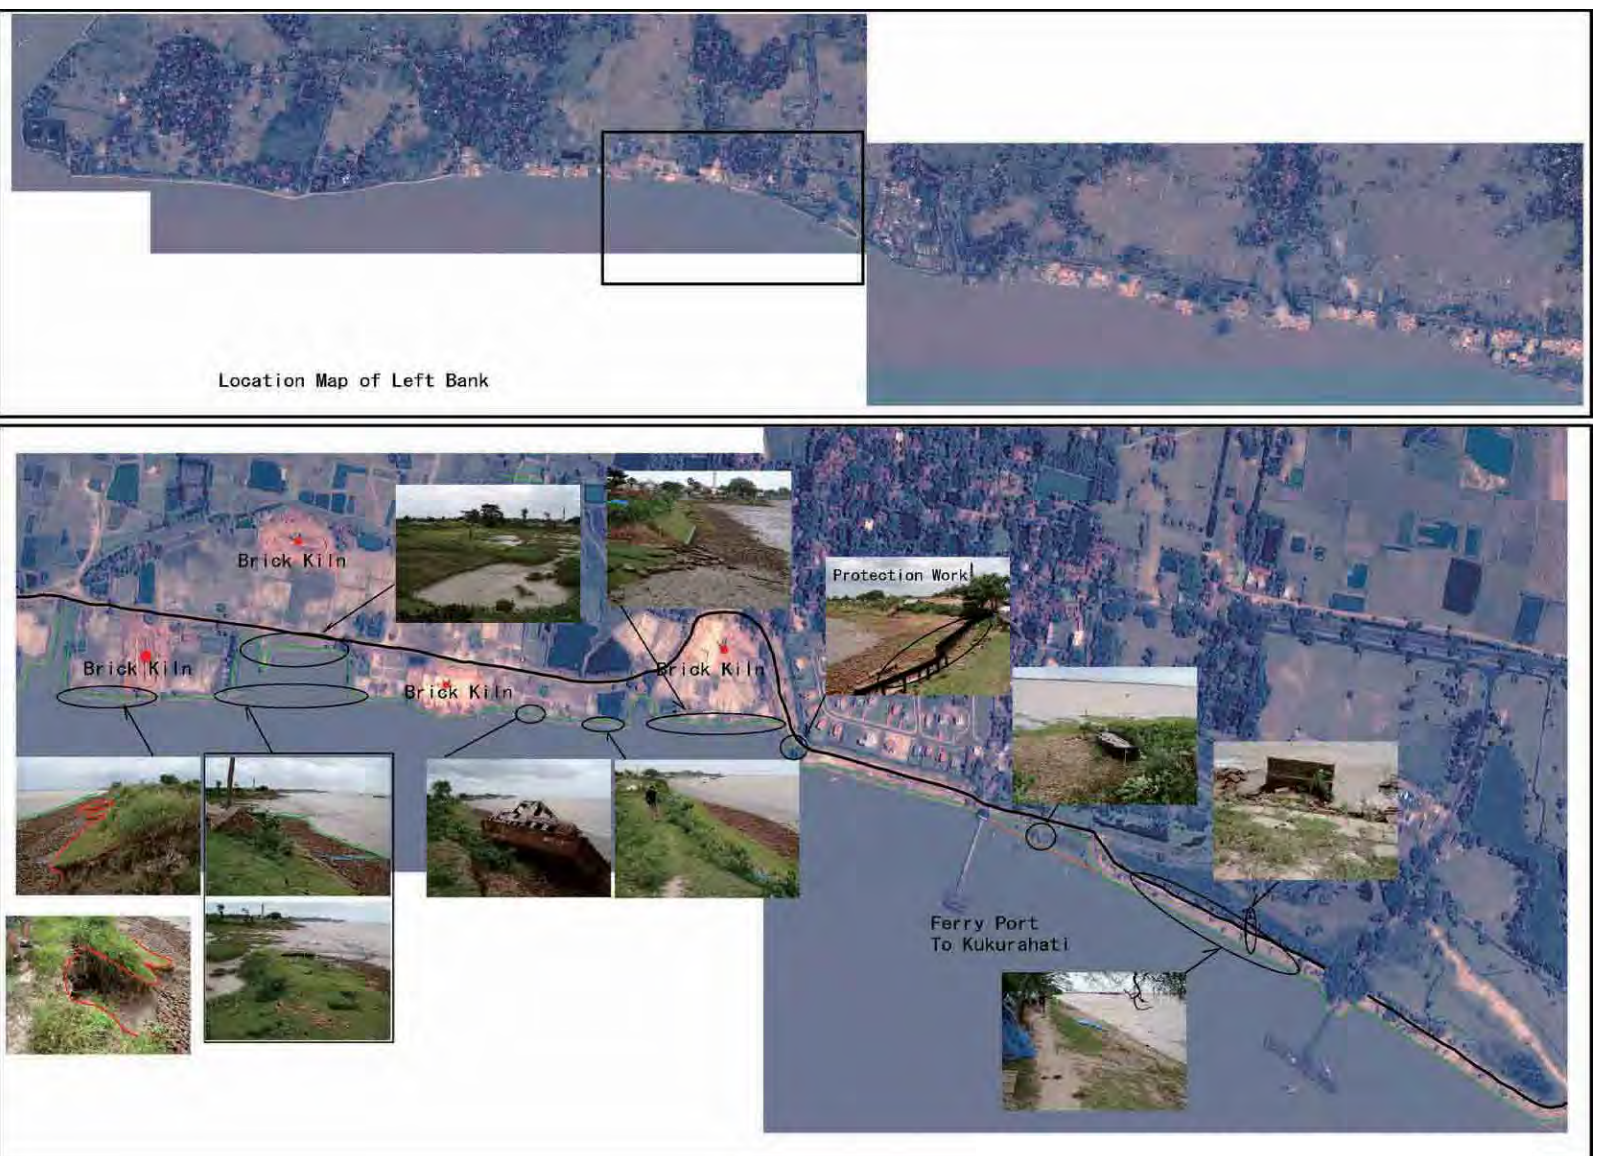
River Bank Protection Works at Left Bank (3/6)
